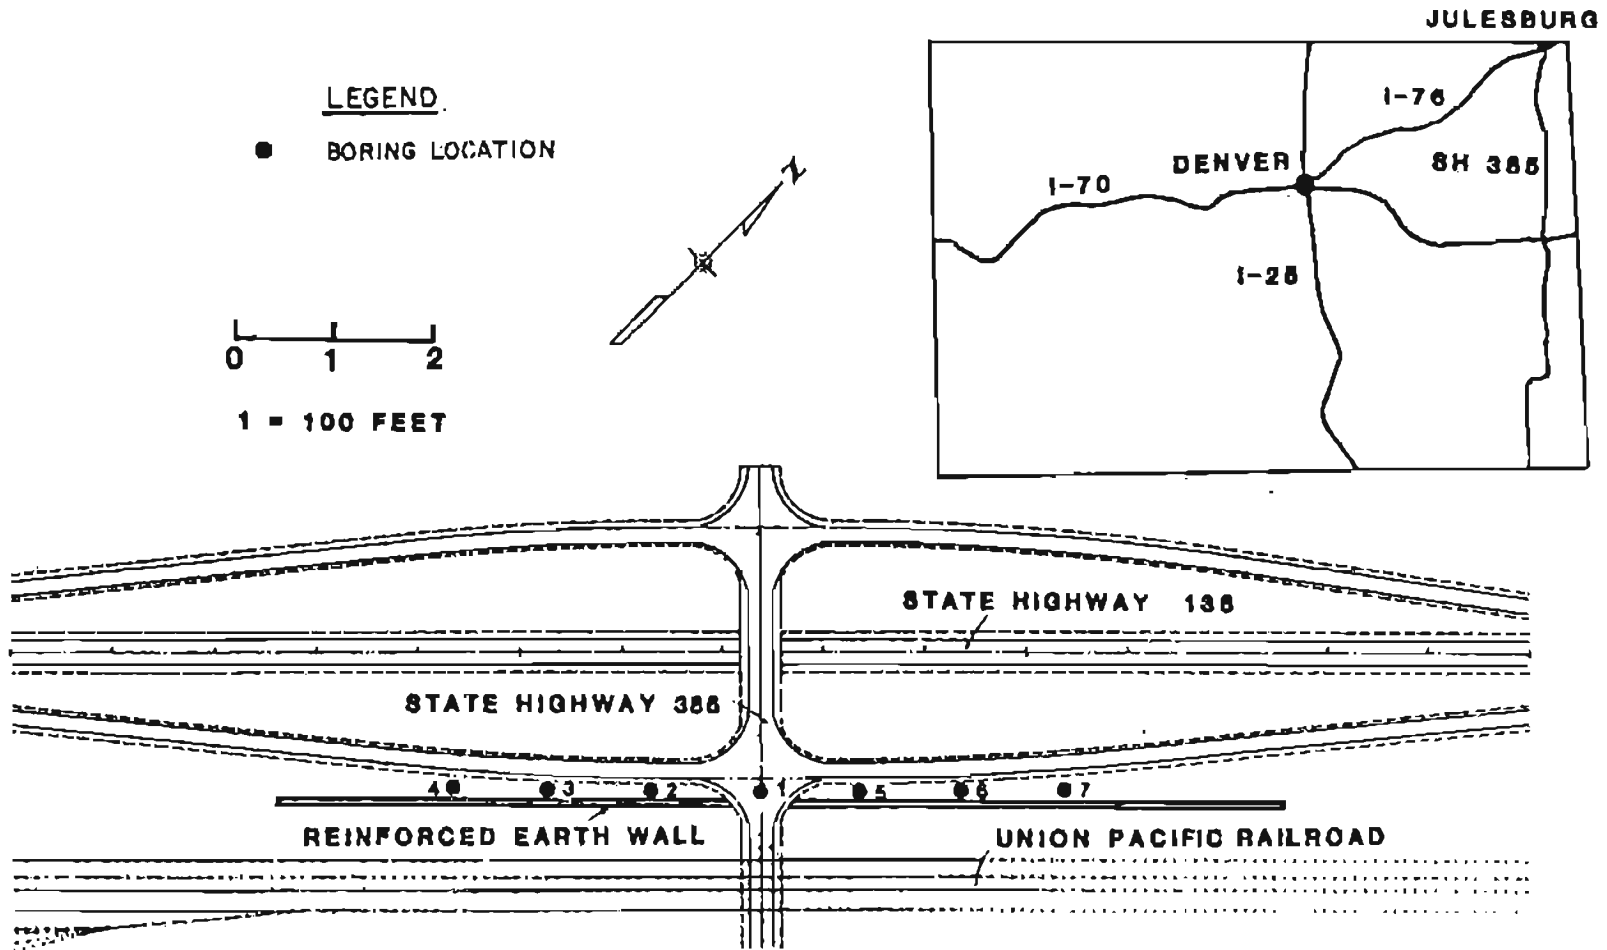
Site Location of Julesburg Reinforced Earth Wall
